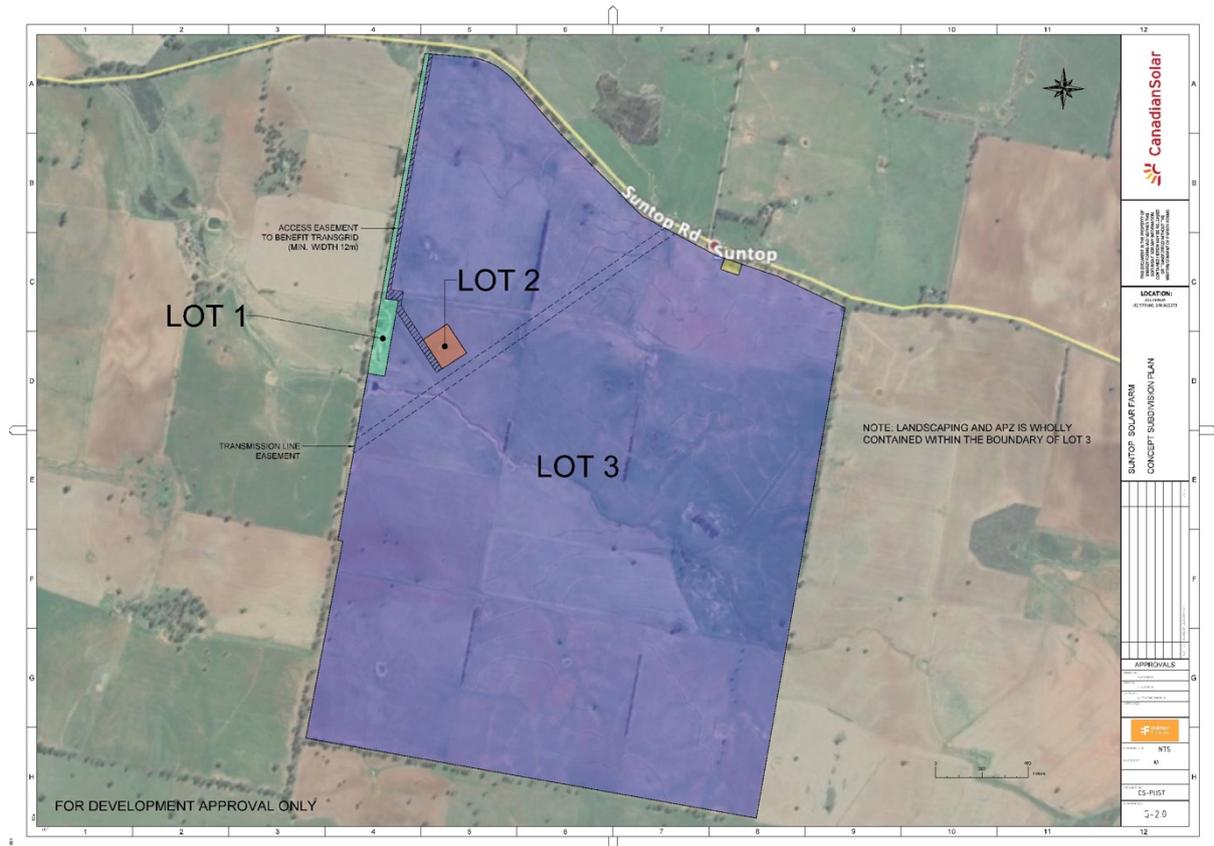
PROPOSED MODIFICATION TO SUBDIVISION RELOCATING LOT FOR THE SUBSTATION AND CREATING AN ACCESS EASEMENT TO THE SUBSTATION (3 LOTS)
